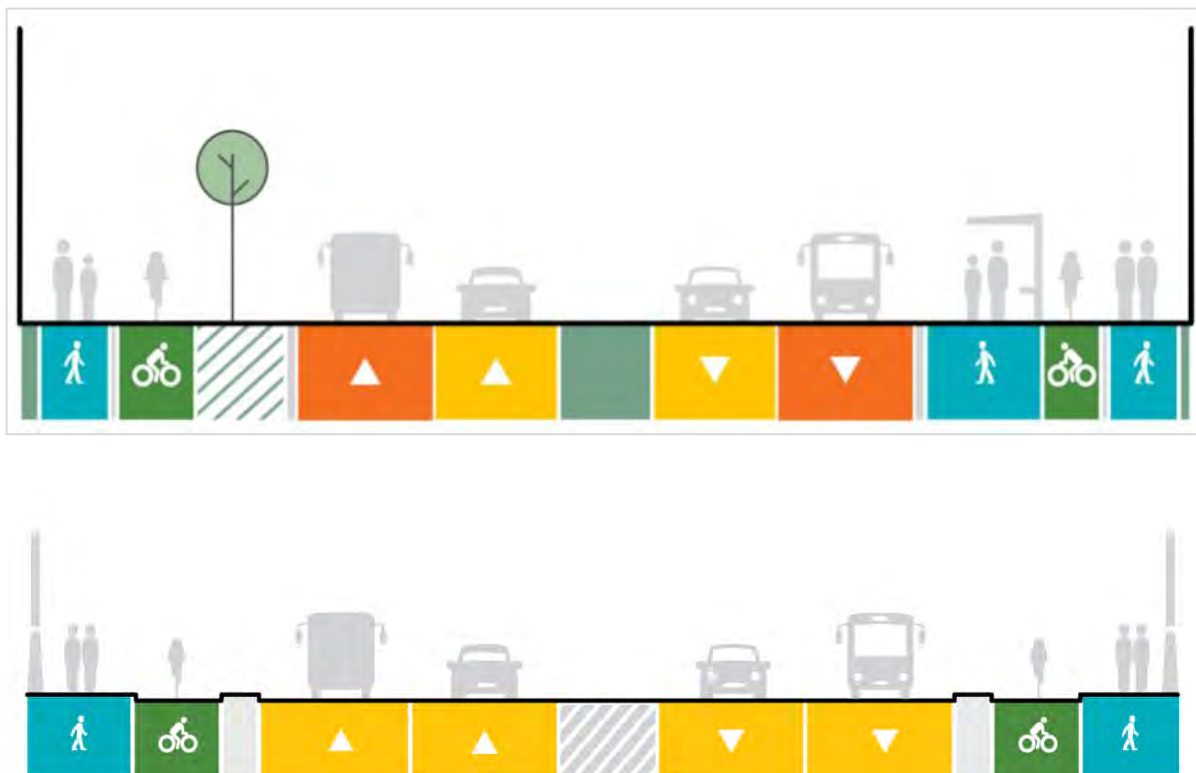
Māmari Road Upgrade Typical Cross Section – Corridor and Bridge
